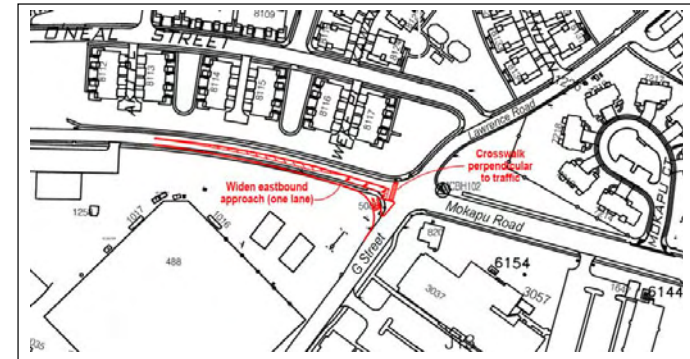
Widening of Mokapu Road, west leg at G Street and Lawrence Street
